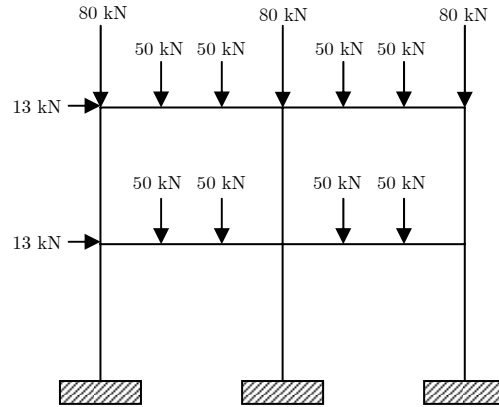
New frame loading for “Frame A” of the “UK” building
